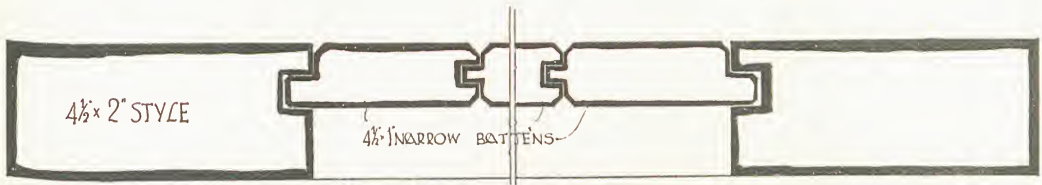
Horizontal section of ledged, framed, braced, and battened door.
